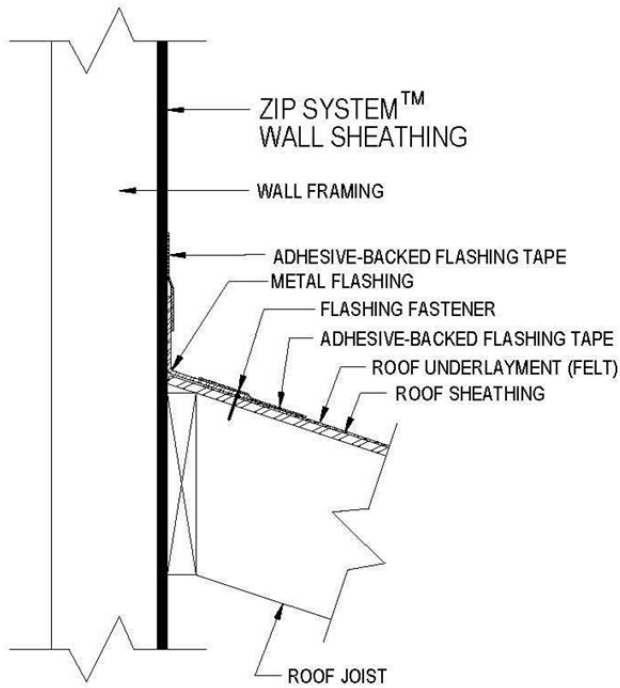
ROOF-WALL INTERSECTION (OPTION 1)
